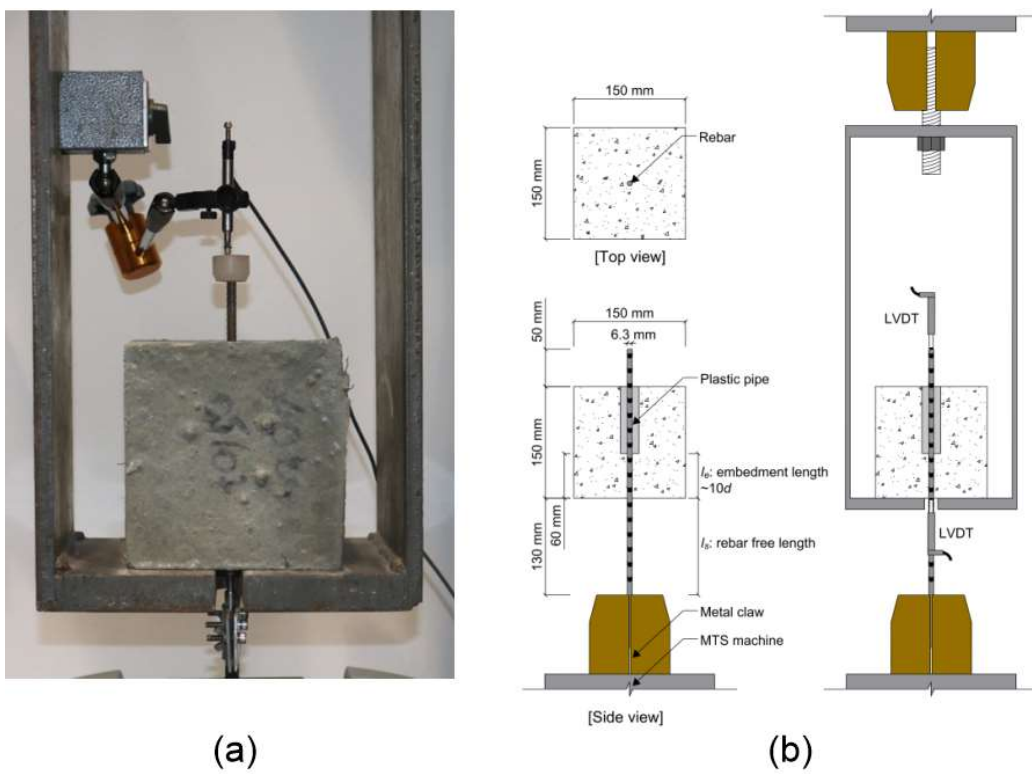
Pull out test setup: (a) test photo and (b) test illustration.
